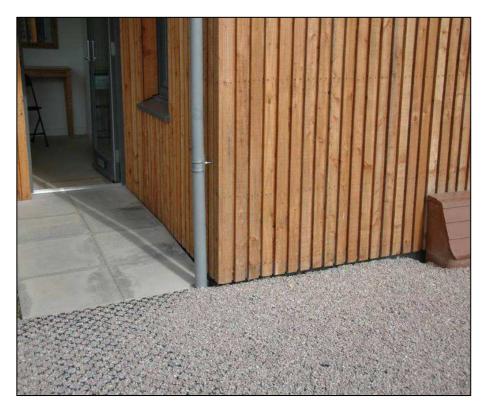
This access ramp to a door will cause a splashzone, as will the ground level being too close to the cladding, and the plastic meter box.
